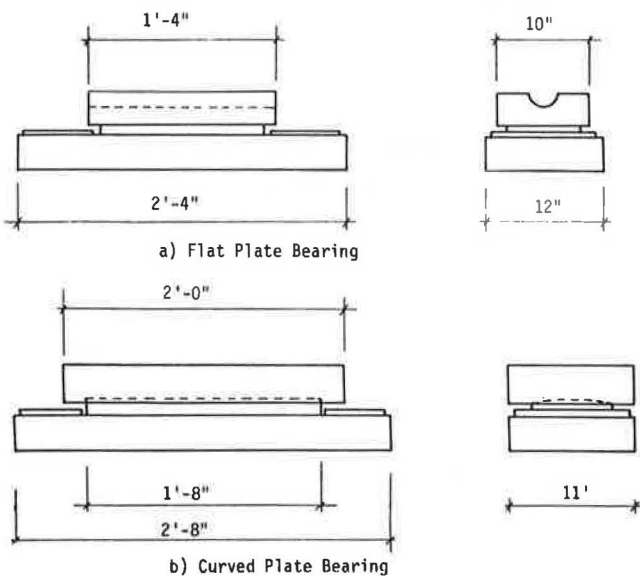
Self-lubricating bronze expansion bearings used in testing.
